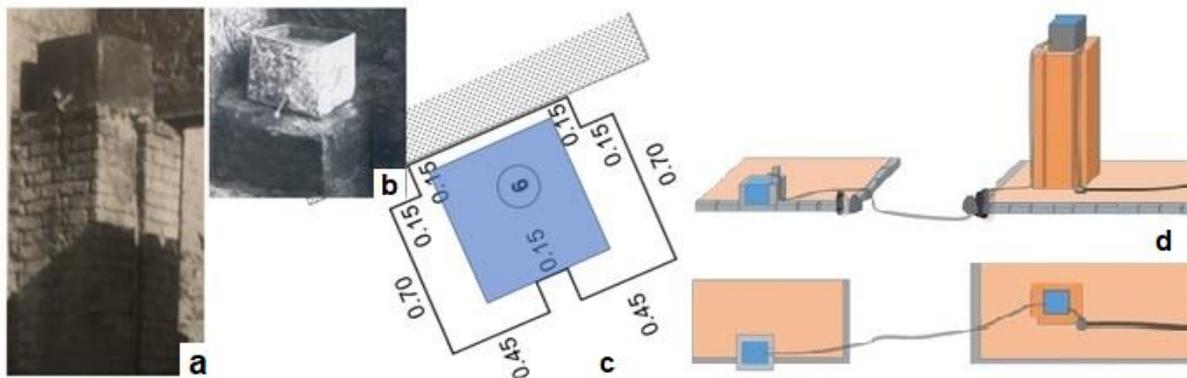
(a,b) Photos of the lead tank found on top of tower 6 (Spinazzola 1917); (c) size of the tank compared with the cross-section of the tower (data on the tower from Olsson 2015); (d) scheme for the unique fountain-to-tower connection assumed in this study.
